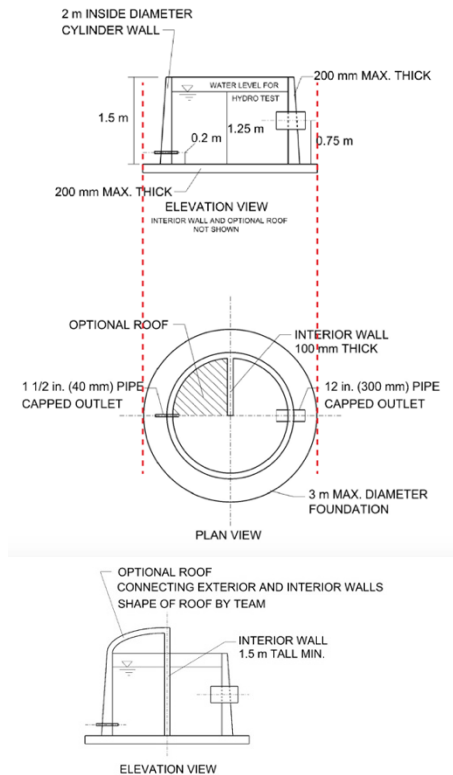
Plan & elevation view of habitat element structure for hydrostatic test
